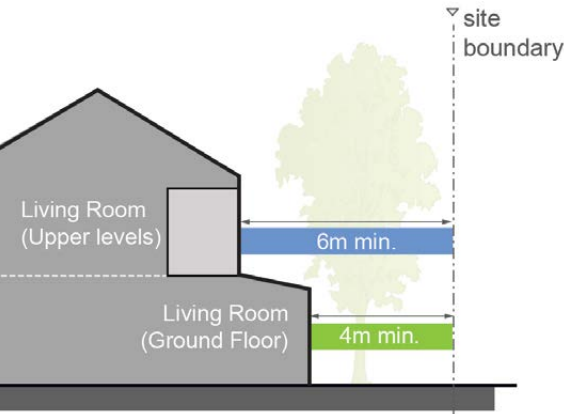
Ground level and upper level living rooms should have greater setbacks to neighbours to improve privacy
